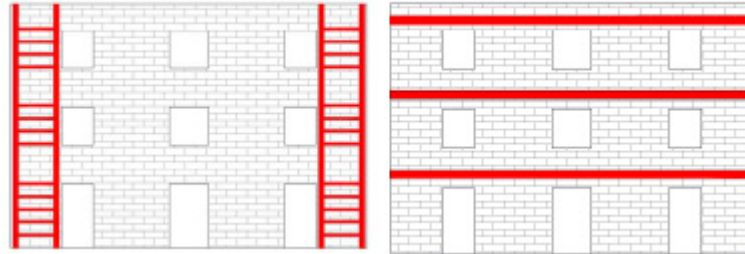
FRP system application for masonry reinforcement (Source: CNR, 2012)
